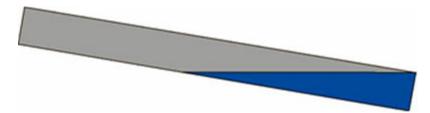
http://www.perviouspavement.org/design/hydrological.html
